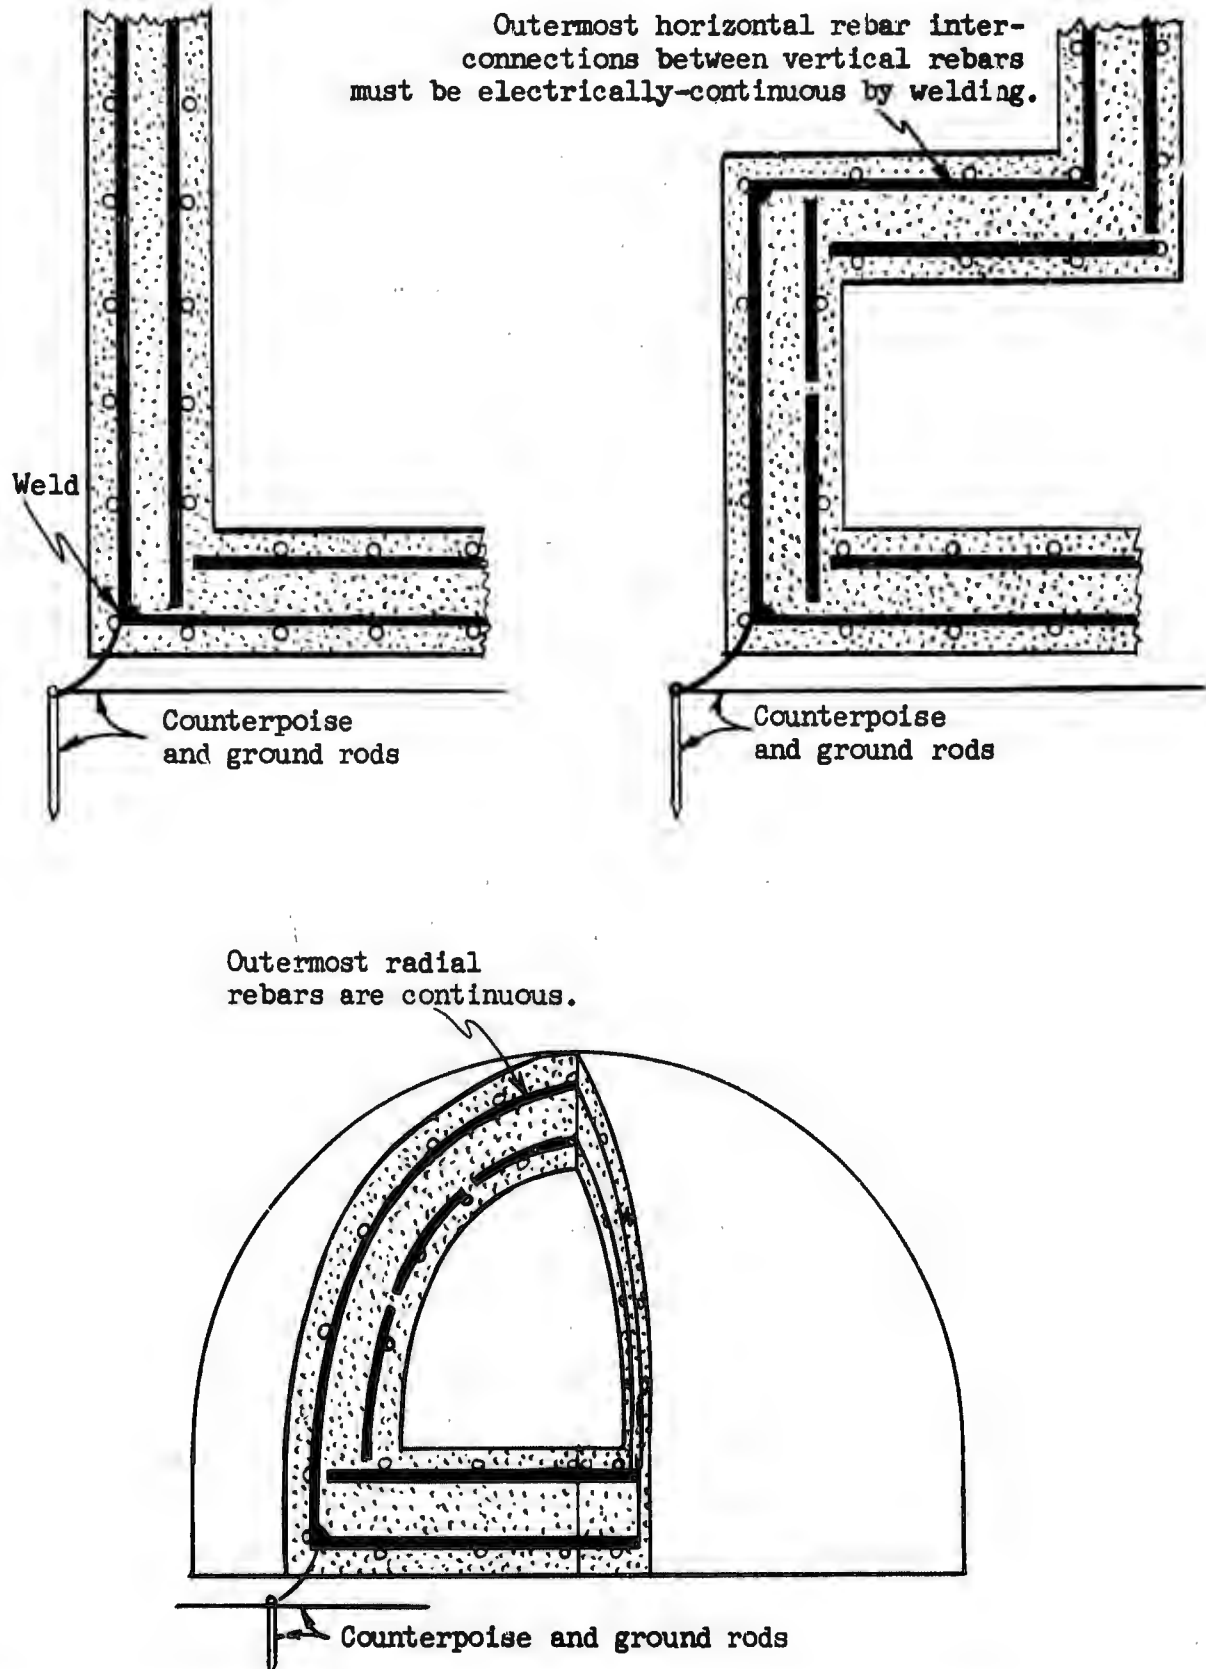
Connection of Outermost Rebars for Electrical Continuity for Various Shaped Buildings
